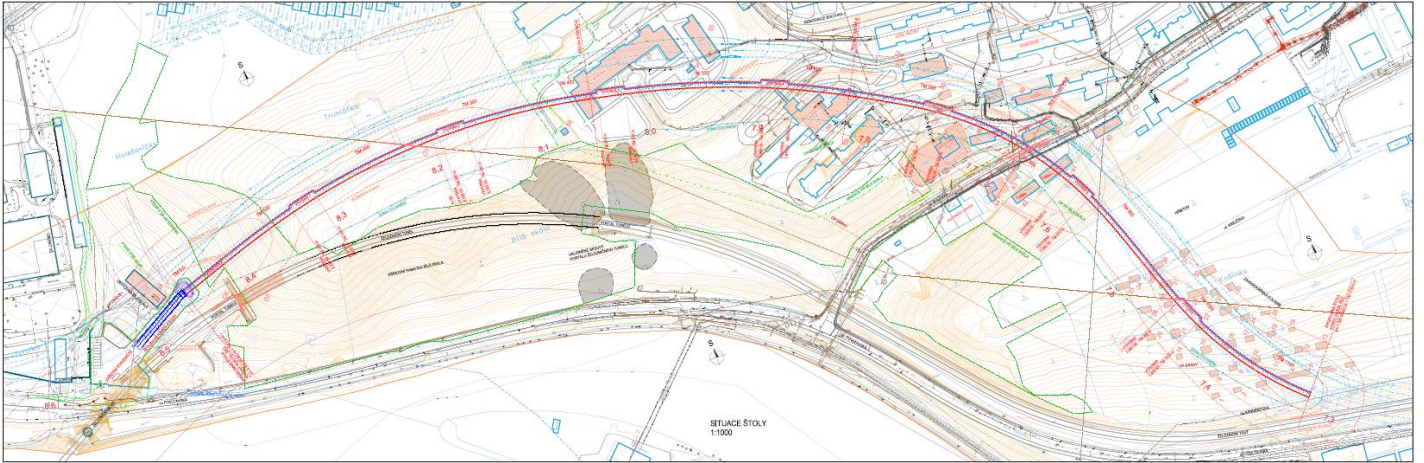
Layout of the exploratory adit; construction site and adit portal on the left
